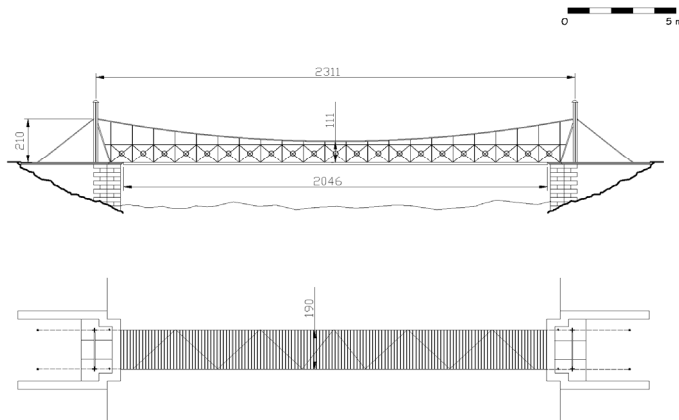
Plan and elevation. Iron suspension bridge in Wissekerke. 1824.
